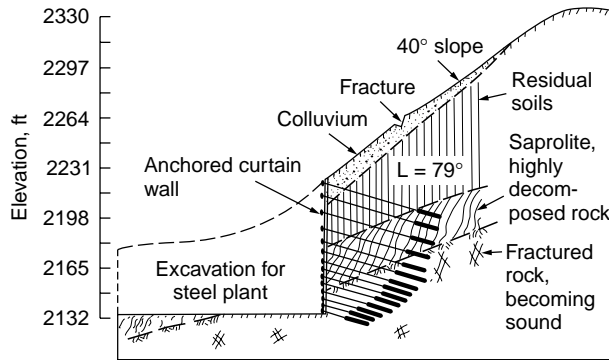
Section through a 25.5 m (85 ft) high anchored curtain wall constructed to retain a steep slope with a history of landslides. Joao Monlavade, M. G. Brazil. (Source: Hunt, R. E., and da Costa Nunes, A. J. 1978. Retaining walls: Taking it from the top. *Civ. Eng.*, ASCE, May, 73–75.)
